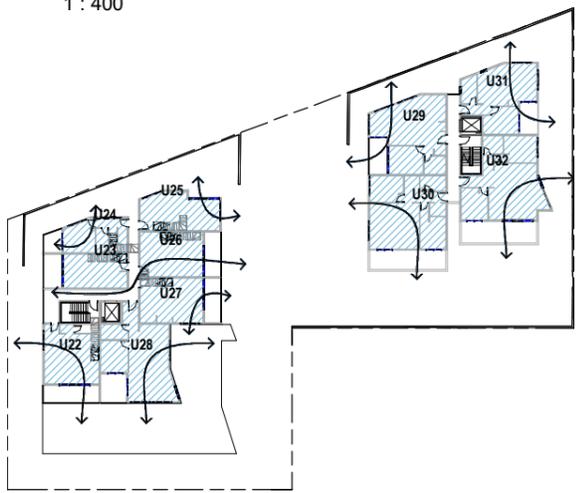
B.4 The floor plan above demonstrates one approach for how five of a total of eight apartments achieve natural cross ventilation
